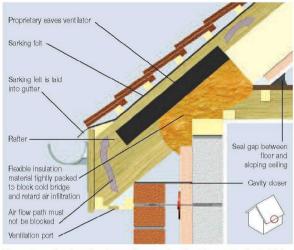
Overhanging Eaves Detail - Section Perpendicular to Ridge
